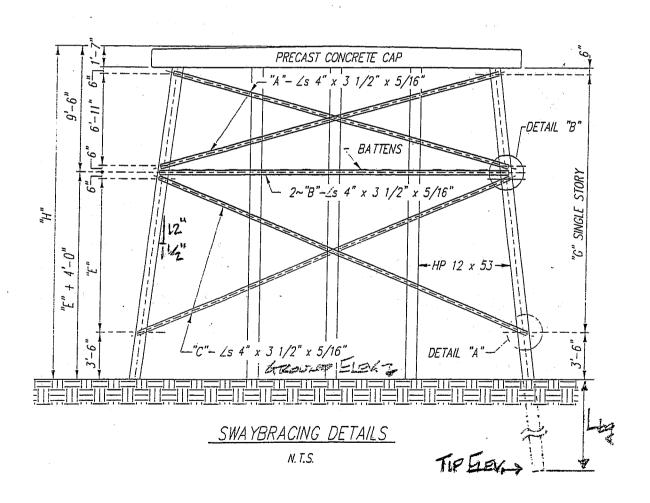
Typical ALDOT Bridge Pile Bent
